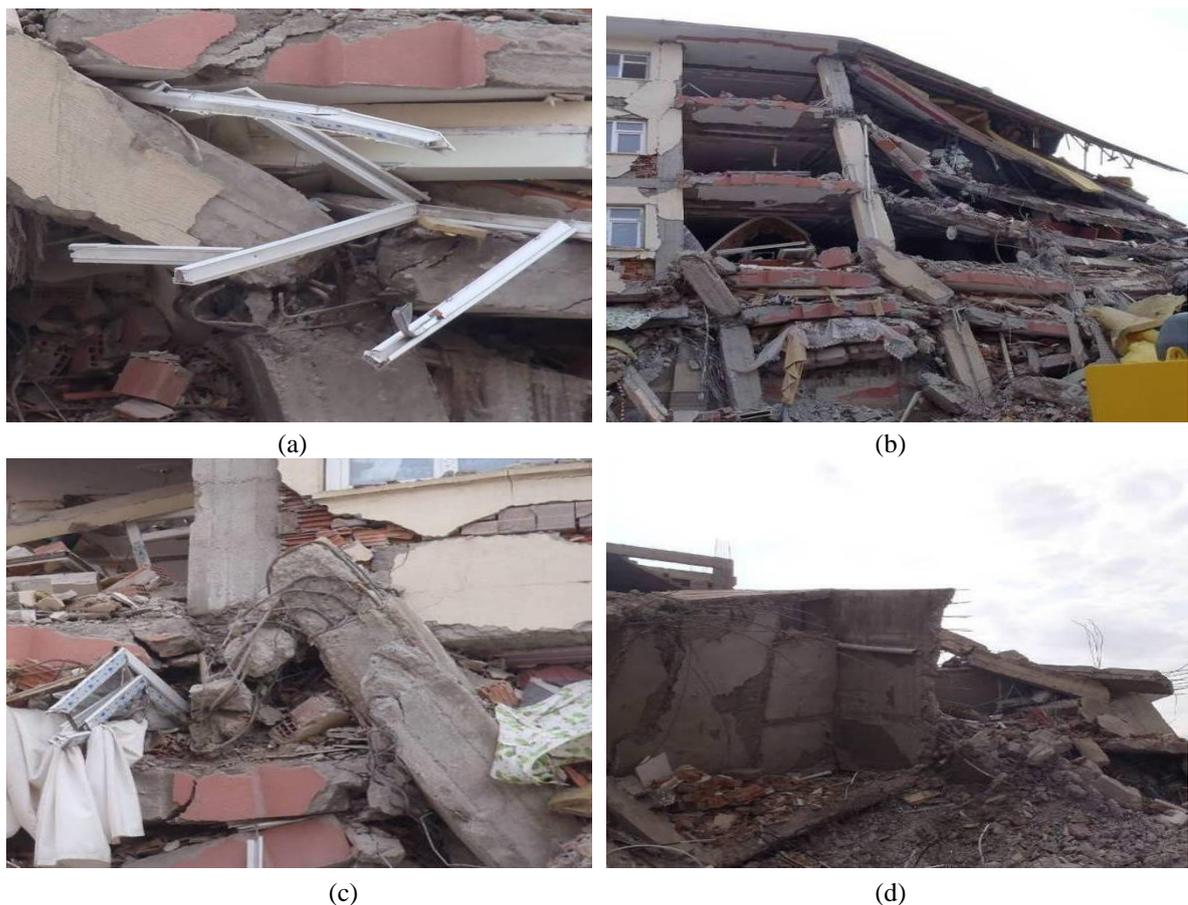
(a) Joint damage, (b) totally collapsed building with heavily damaged joints, (c) joint damage and (d) disintegrated shear wall with debonded longitudinal reinforcement
